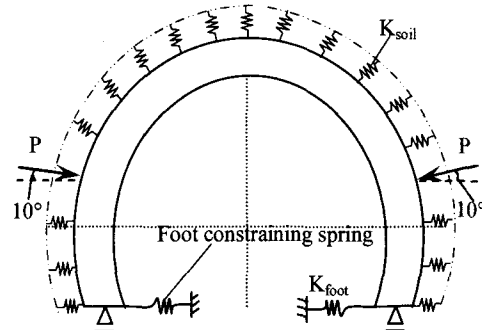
Concrete tunnel specimen and experimental setup (unit: mm)
